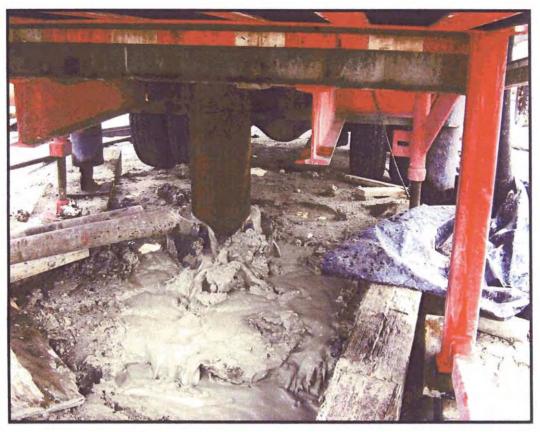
Circulating Drilling Mud Prior to Grouting of 12-inch Casing
